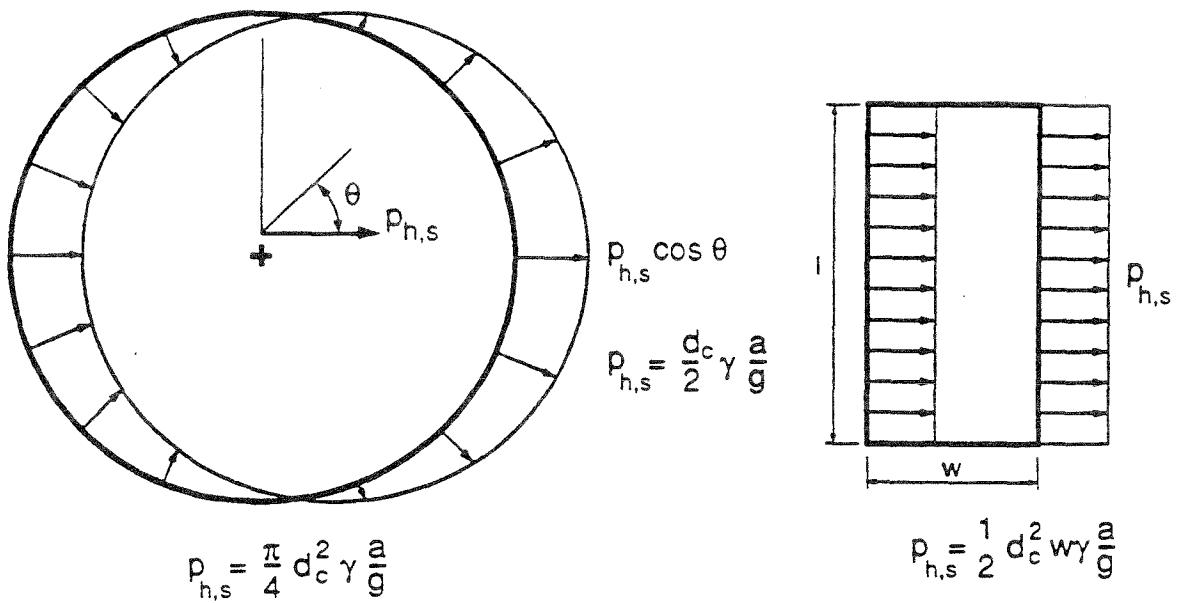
Plan view of the additional earthquake loads on the vertical walled sections of silos with circular and rectangular cross section shapes
